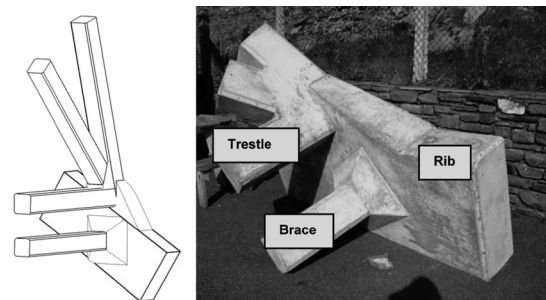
Trial panel comprising braced arch rib section at trestle support.
